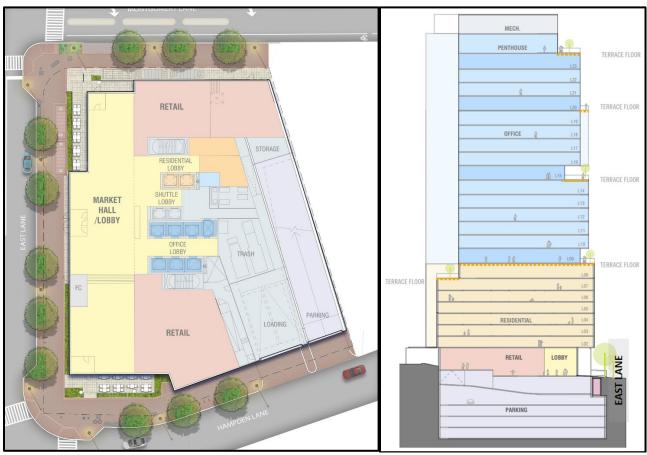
Rendered Site Plan (left) Building Section showing mix of uses (right)
